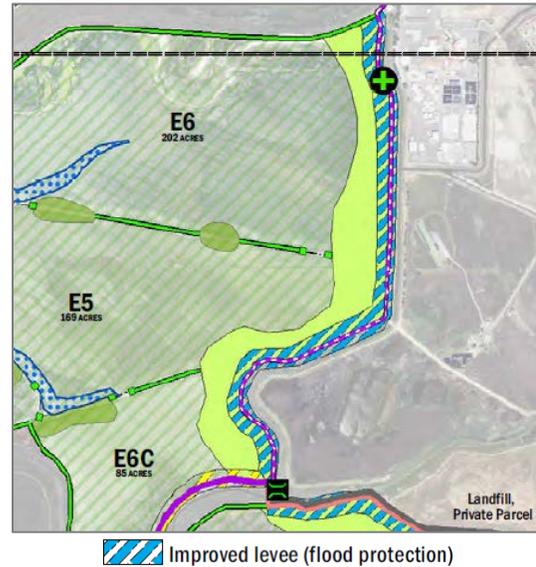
Plan of Inland Ponds Landside Levee (Alt. B)
